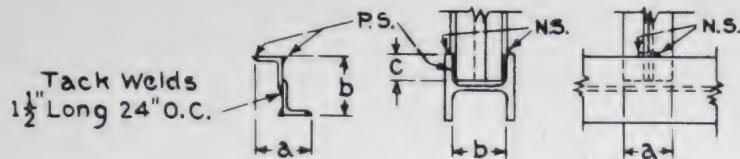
Detail at Apex of Arc-welded Truss
